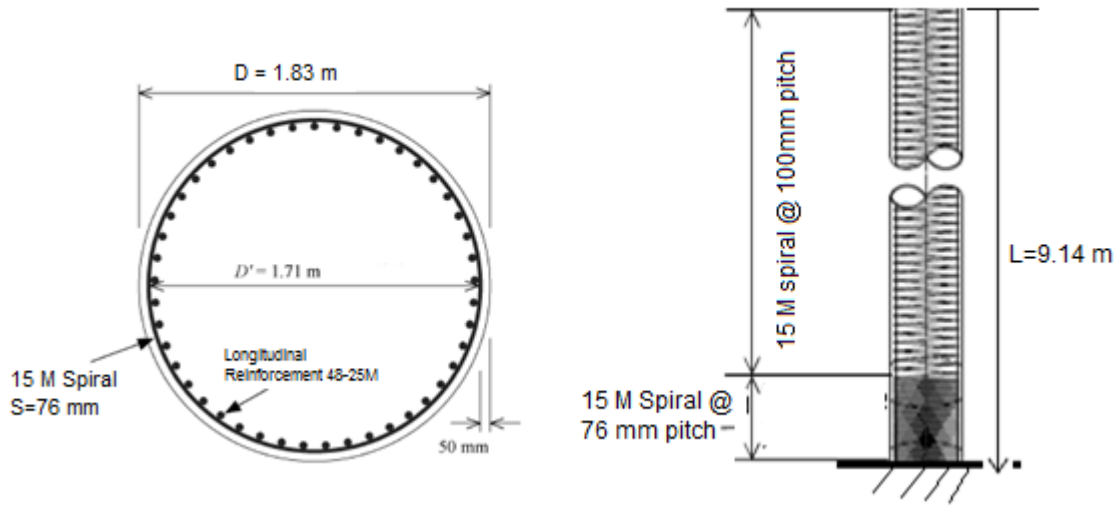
Cross section and elevation of reinforced concrete bridge pier
